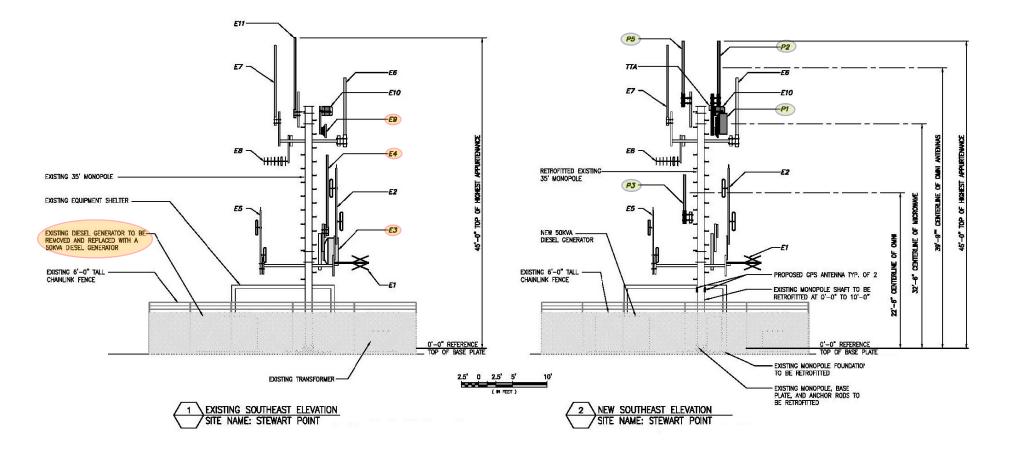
Site 19 - Stewart Point Existing and Proposed Elevations
